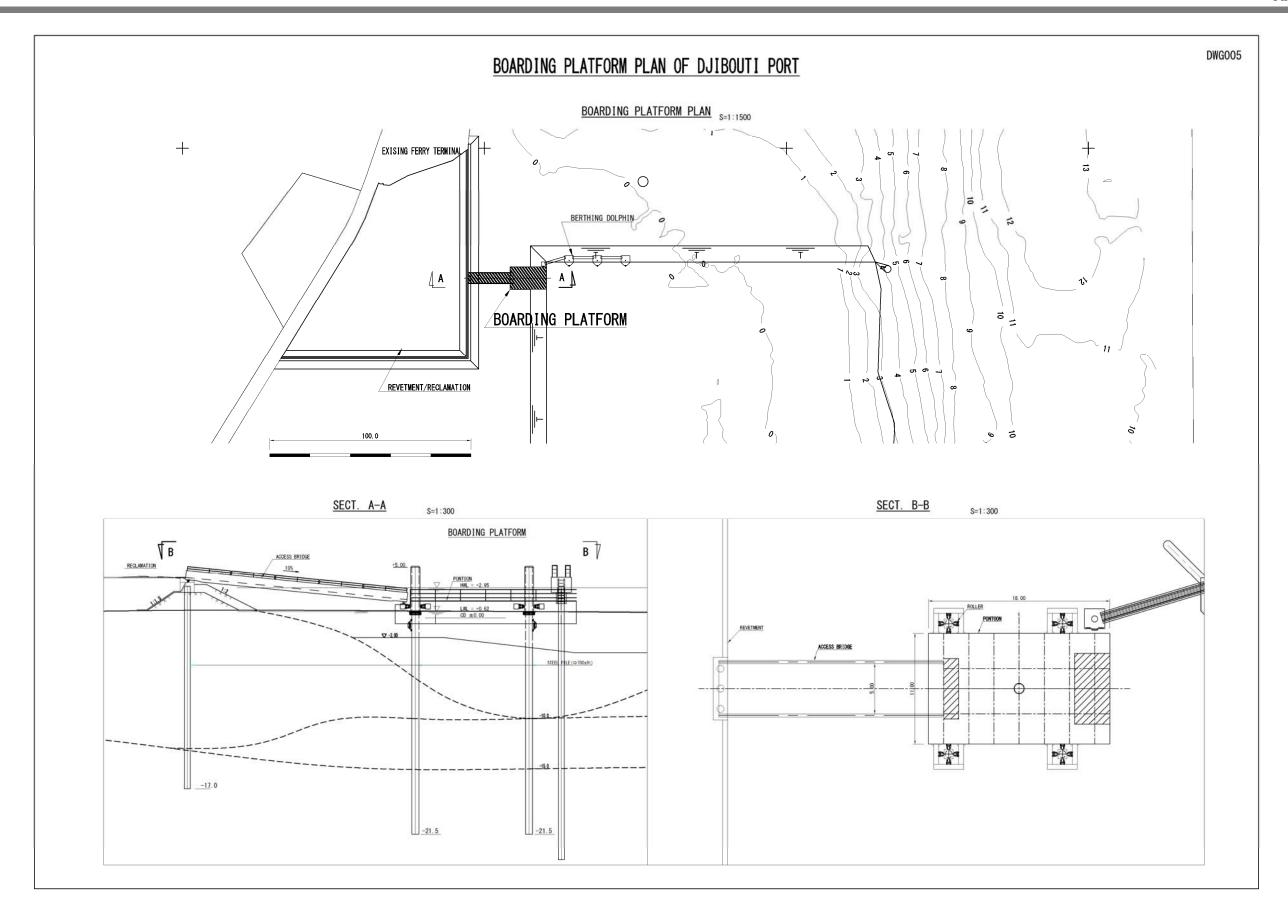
Boarding Platform Plan of Djibouti Port
